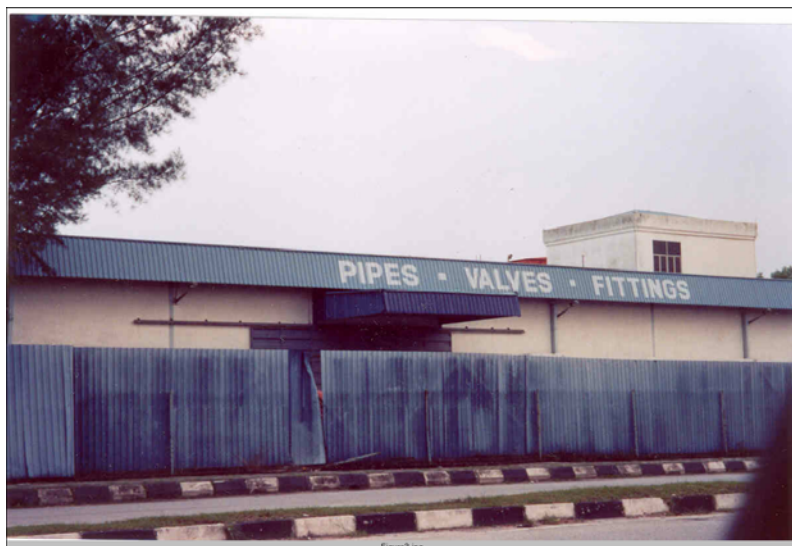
A typical industrial building using precast hollow core walls as load-bearing wall constructed in Malaysia.
